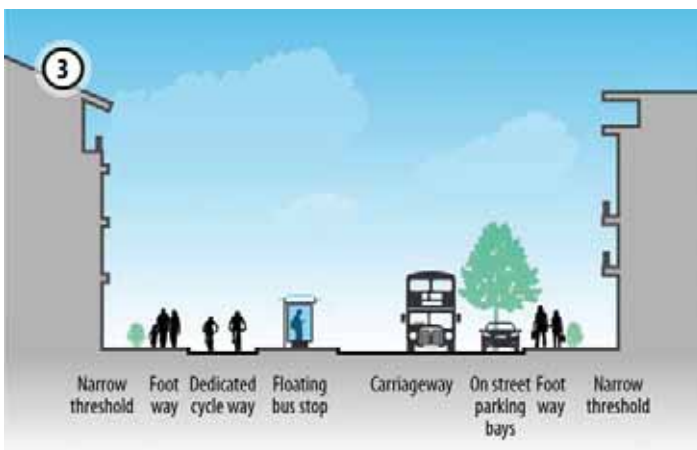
Indicative Street Section 3: Primary Street, West Ashton.
